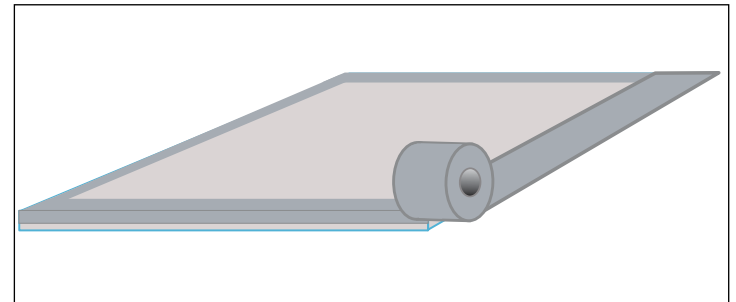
Apply 1-3/4" QuietRF® tape to cut edge of panel
